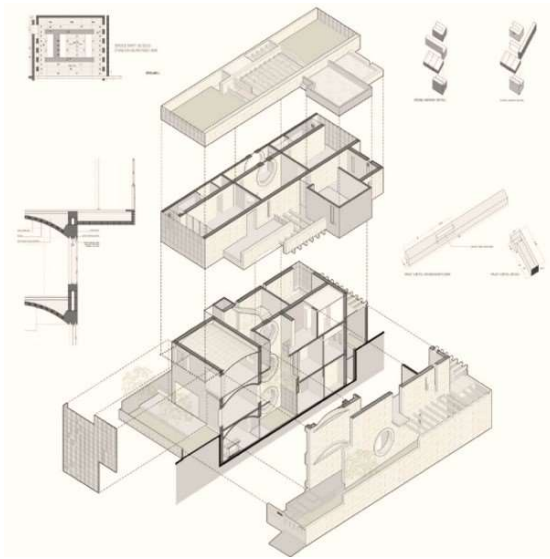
Exploded Isometric view of the construction technique (Source: archdaily.com)
